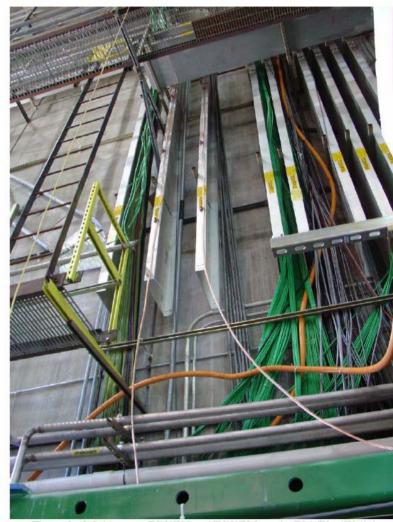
2 Cable trays, TC61F05 and TC61F06, on the ESA West Wall that have been cleared and are being grounded. They will have dividers installed to separate HV and signal cables.
